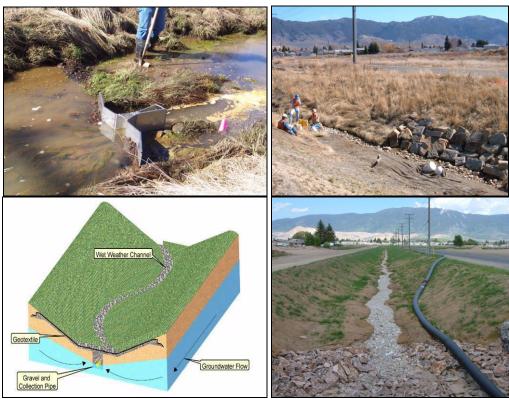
Metro Storm Drain prior to reconstruction (upper left). The remaining three pictures show the reconstructed channel and subdrain. The infrastructure constraints are evident in the lower right photograph.
